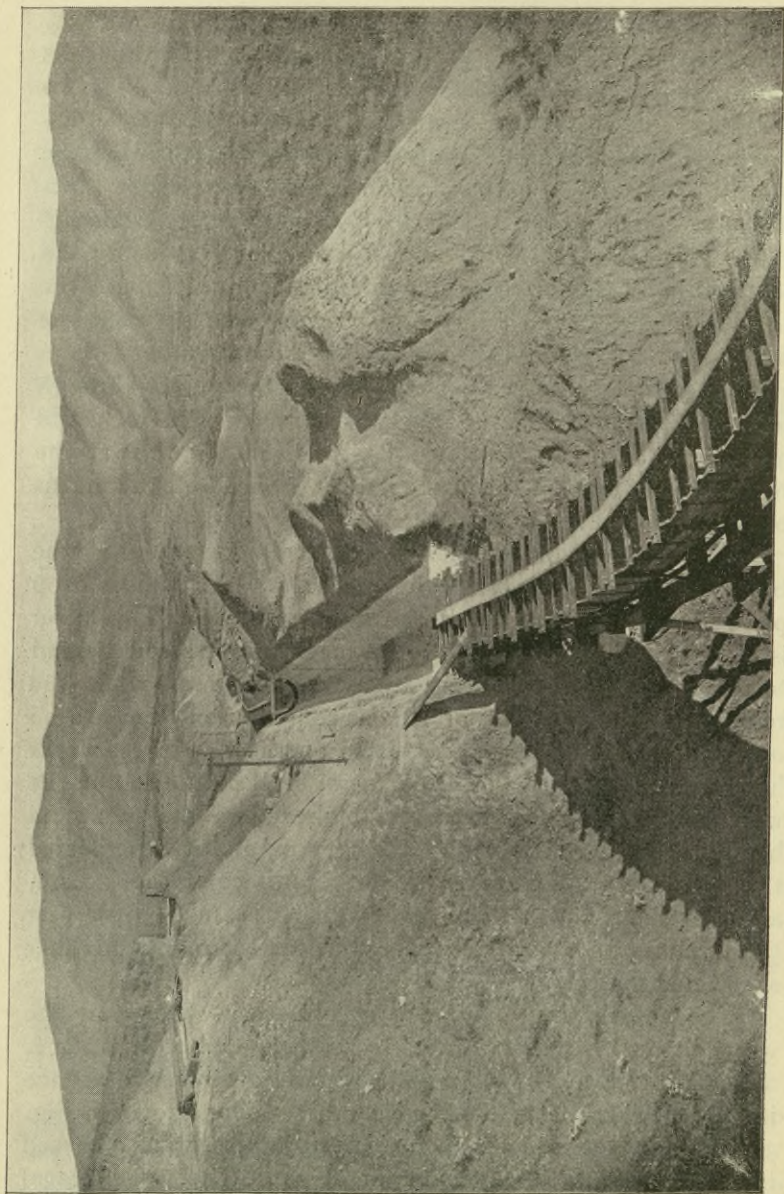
PLATE III.—VIEW ON LINE OF SANTA ANA CANAL.
